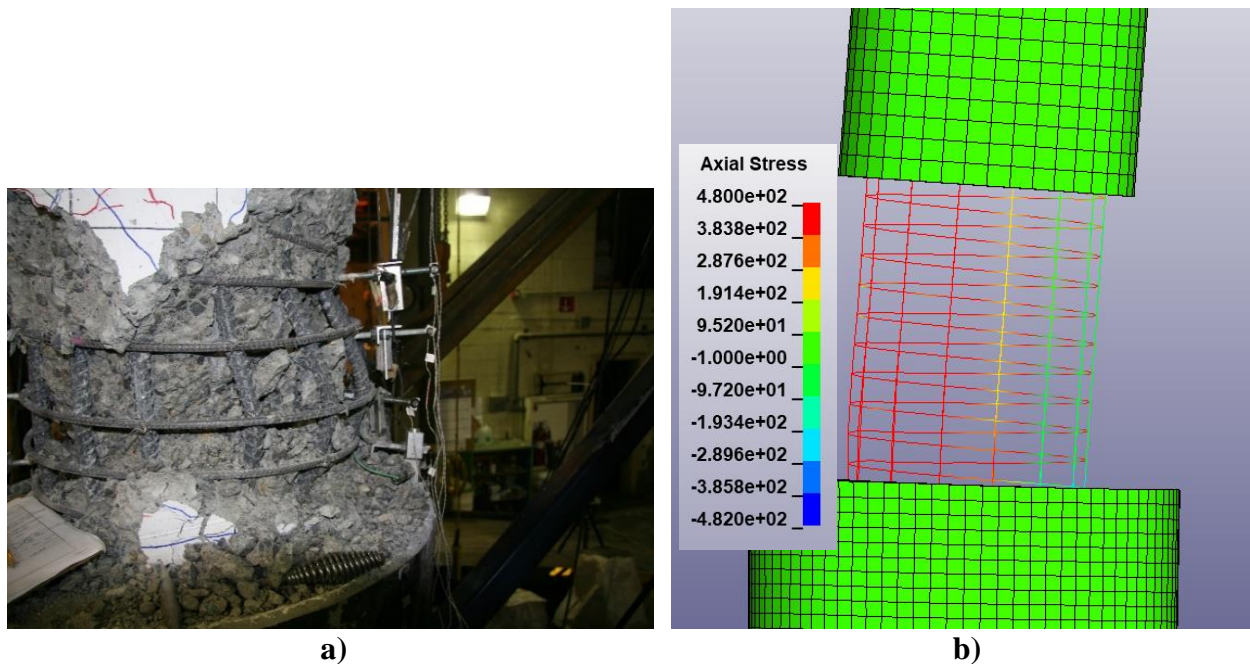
Specimen 30-21 Buckled Reinforcement at Base of Southern Column Face at 8.0% Drift: a) Observed and b) Simulated Reinforcement Axial Stress
